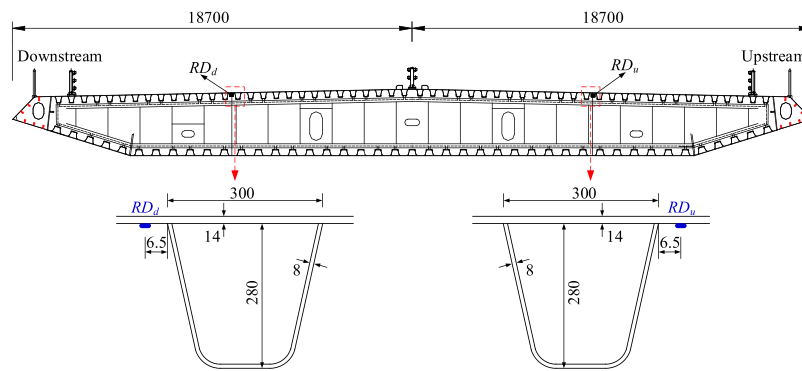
| Layout of strain sensors on the orthotropic steel deck (Unit: mm).
